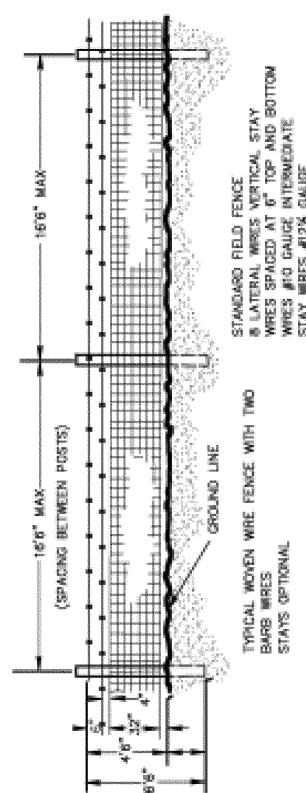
EXAMPLES FOR DESIGN AND CONSTRUCTION OF FENCES AND CORNER POSTS.
